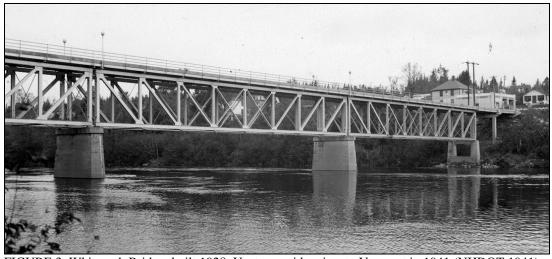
Whitcomb Bridge, built 1928. Upstream side, view to Vermont in 1941 (NHDOT 1941).
